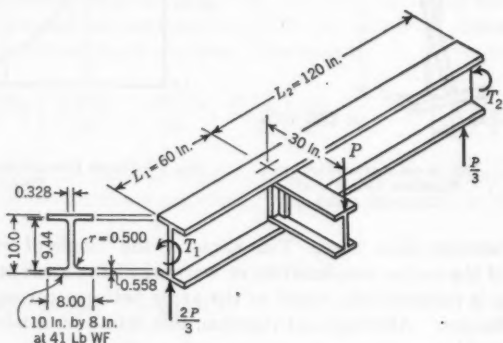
BEAM AND LOADING FOR EXAMPLE 1
